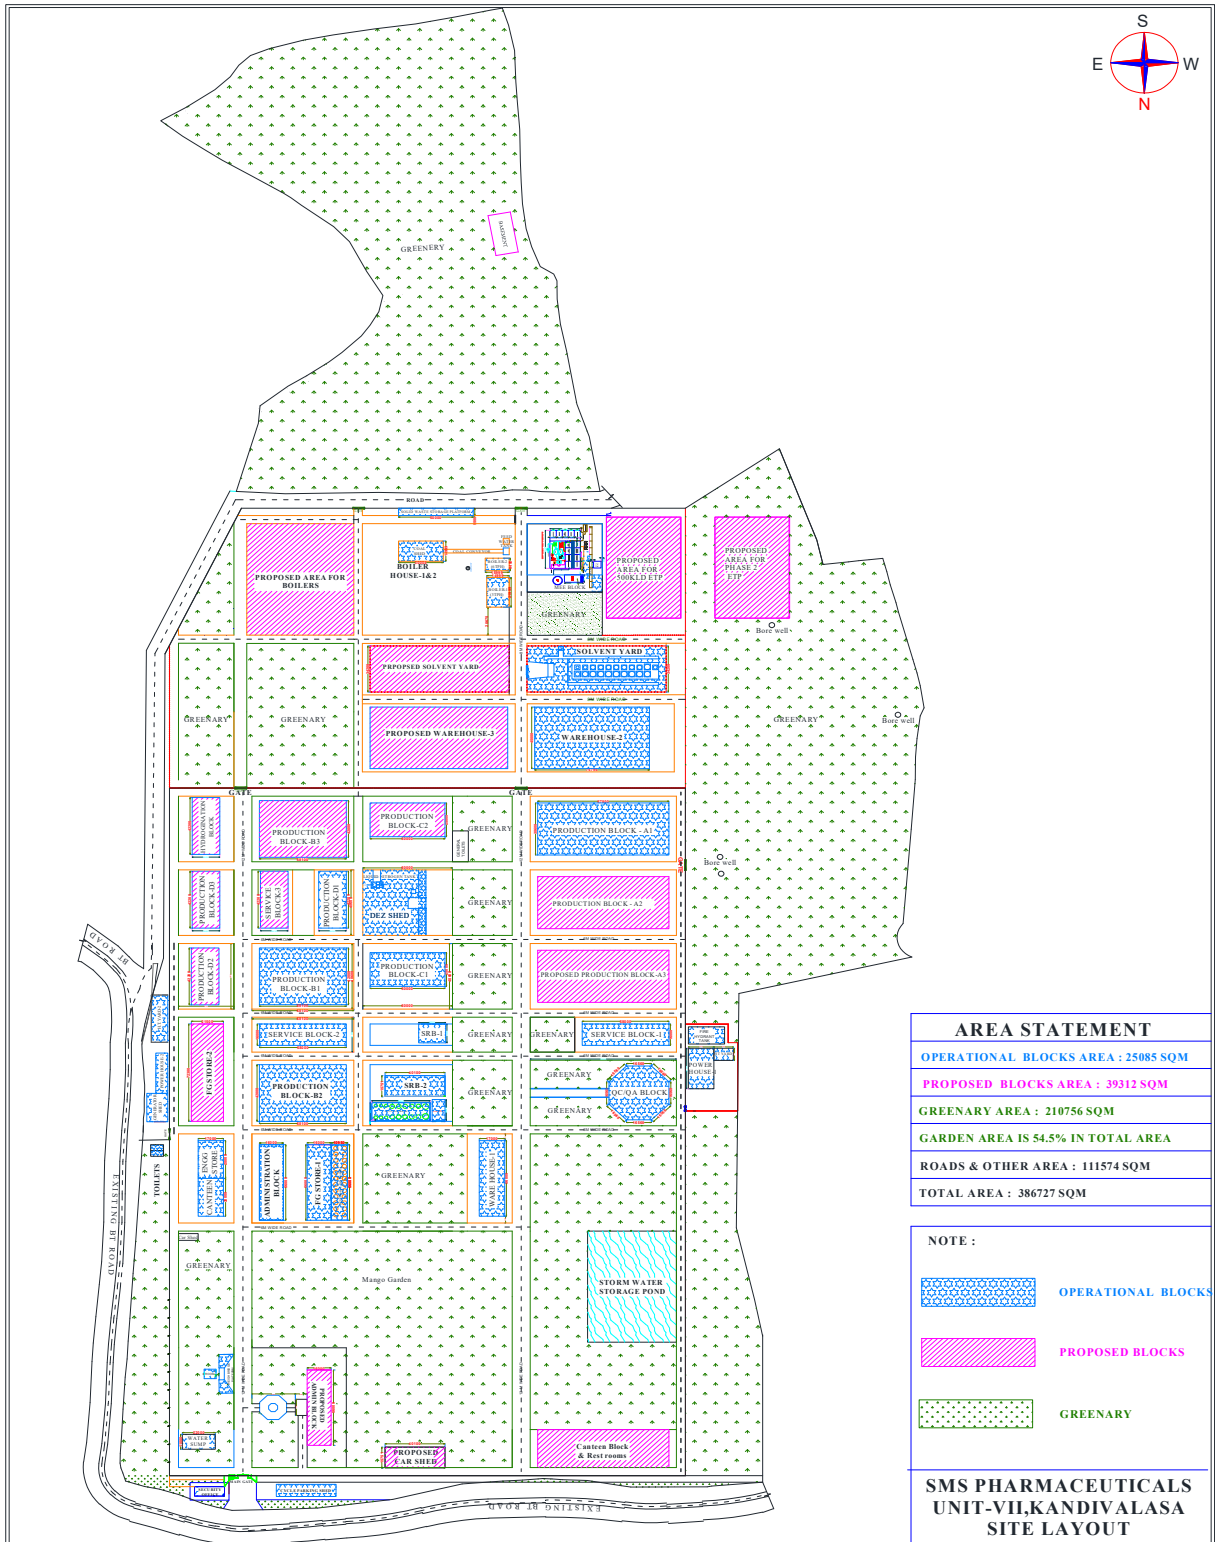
Plant Layout Showing Location of Storm Water Storage Pond
